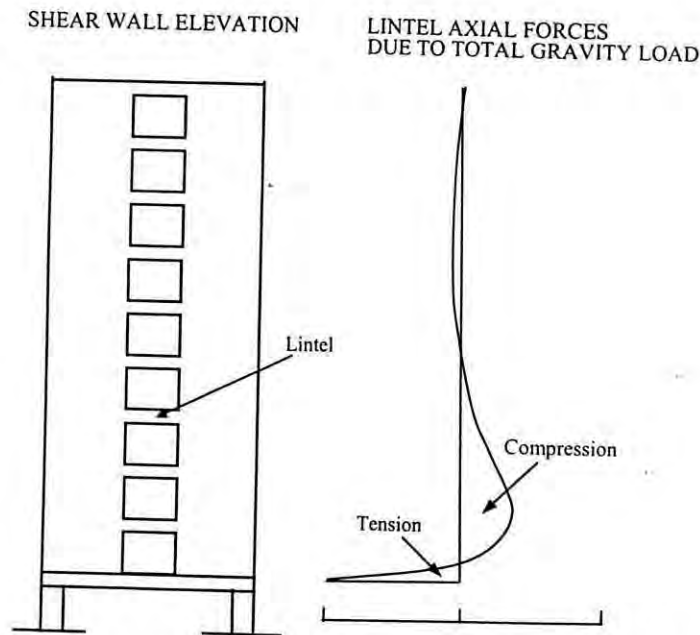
Coupled Shear Walls Supported on Exterior Columns to Accommodate Parking Facilities in the Ground Story (Fintel, 1986).
